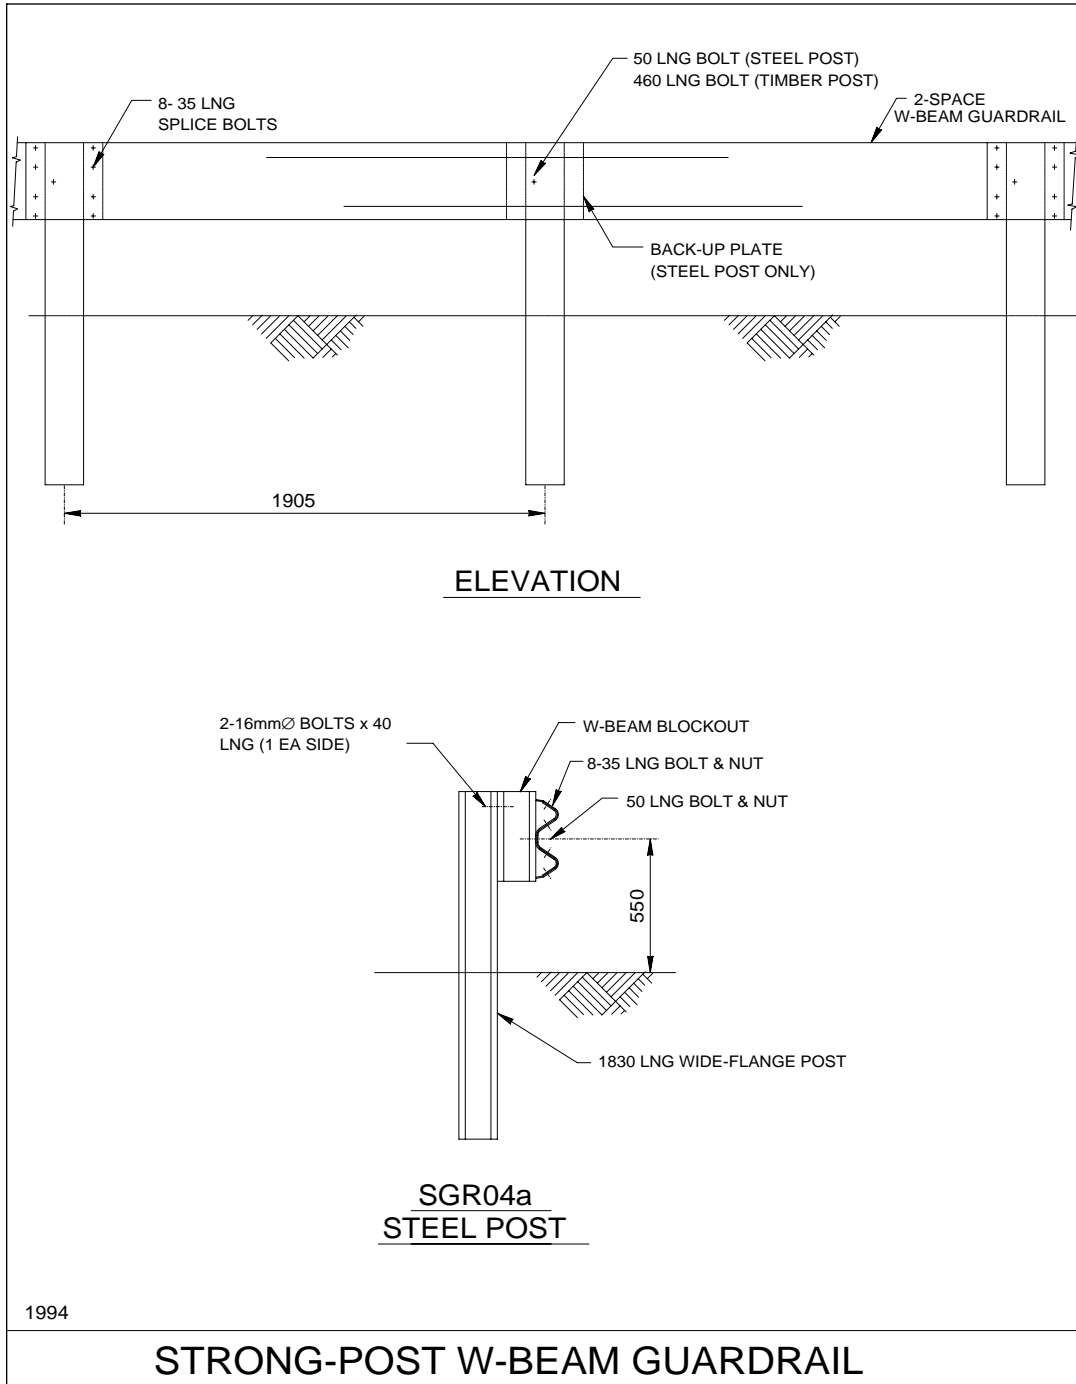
Steel-Post W-Beam Guardrail—SGR04a (measurements are in millimeters).
